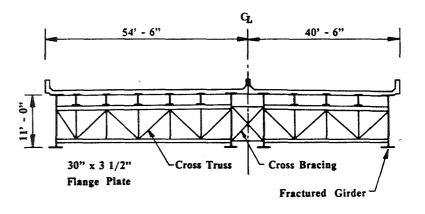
Elevation and Cross Section - I-79 Back Channel Bridge
